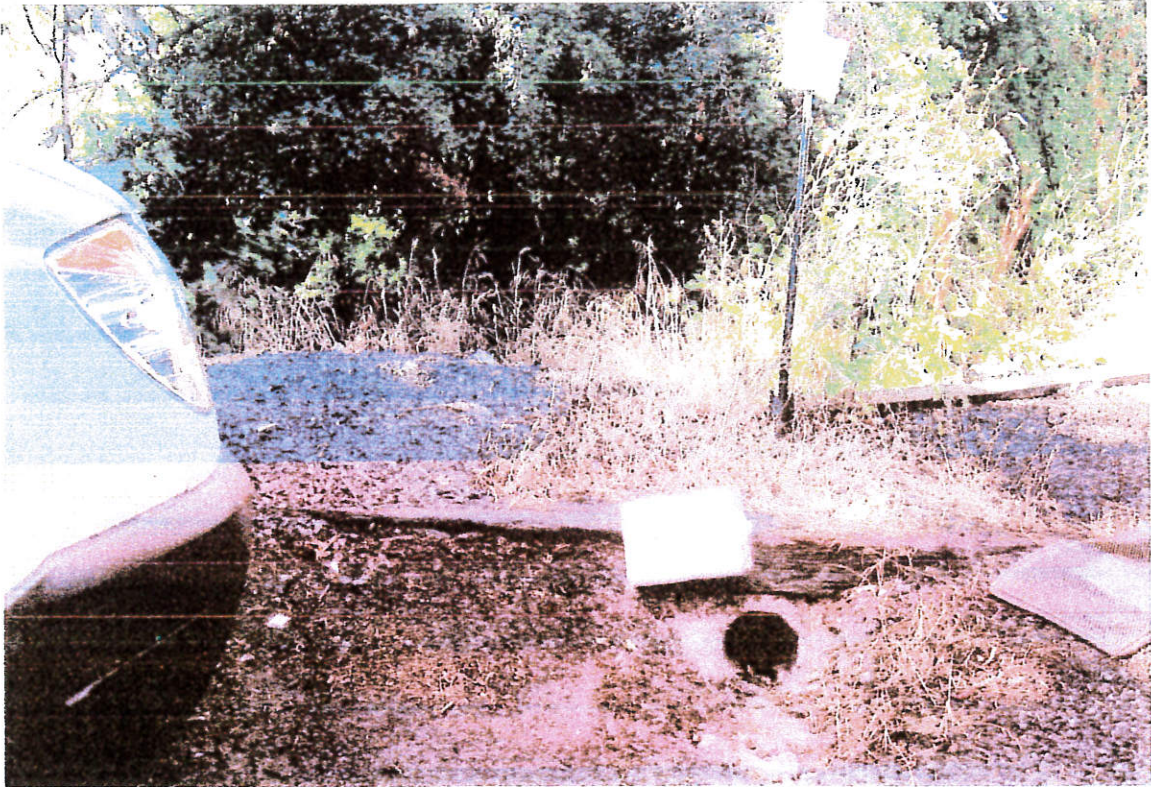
Parking Lot Culverts Funnel Storm Runoff Into Creek.
